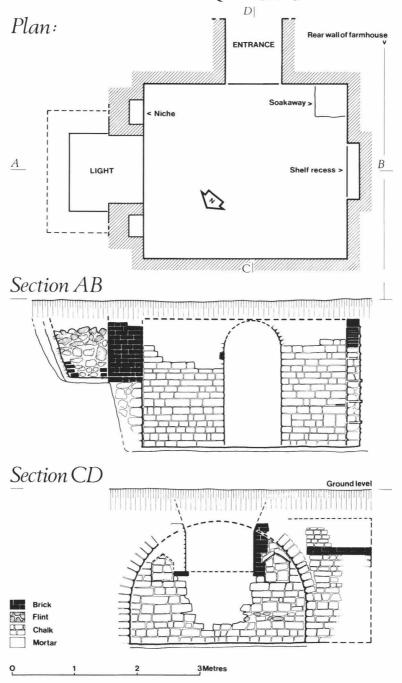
Stapleash farm game larder excavation, 1979. Ground plan of underground chamber (top), with vertical sections AB (centre) and CD (bottom).
